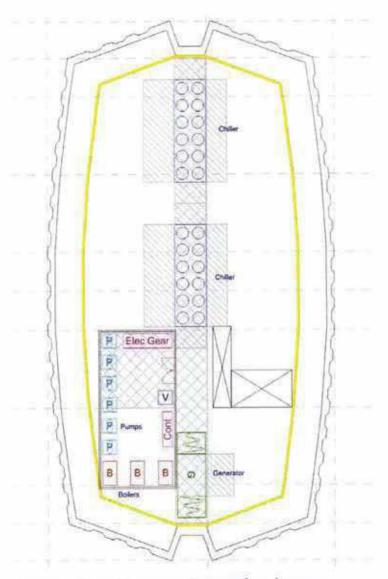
Plan of the proposed new rooftop plant area Camden Council has stipulated that;
